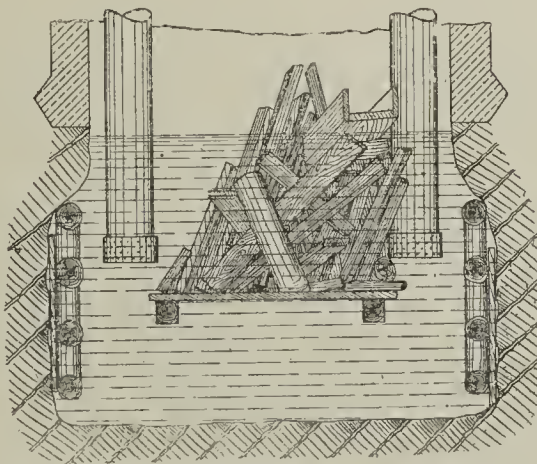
PIT BOTTOM BEFORE CLEARING BY DIVER.
